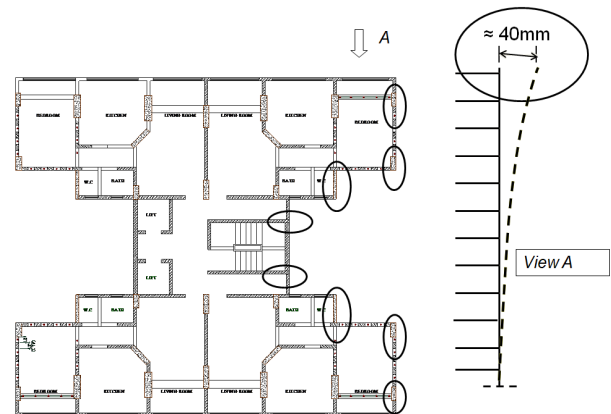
Columns at Ground Floor in Dilapidated condition and tilt of building towards East.
